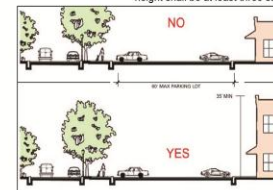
This image depicts how buildings in conventional areas may locate off-street parking in the area between the building's façade and the street it fronts, provided the building is three stories in height or greater.
